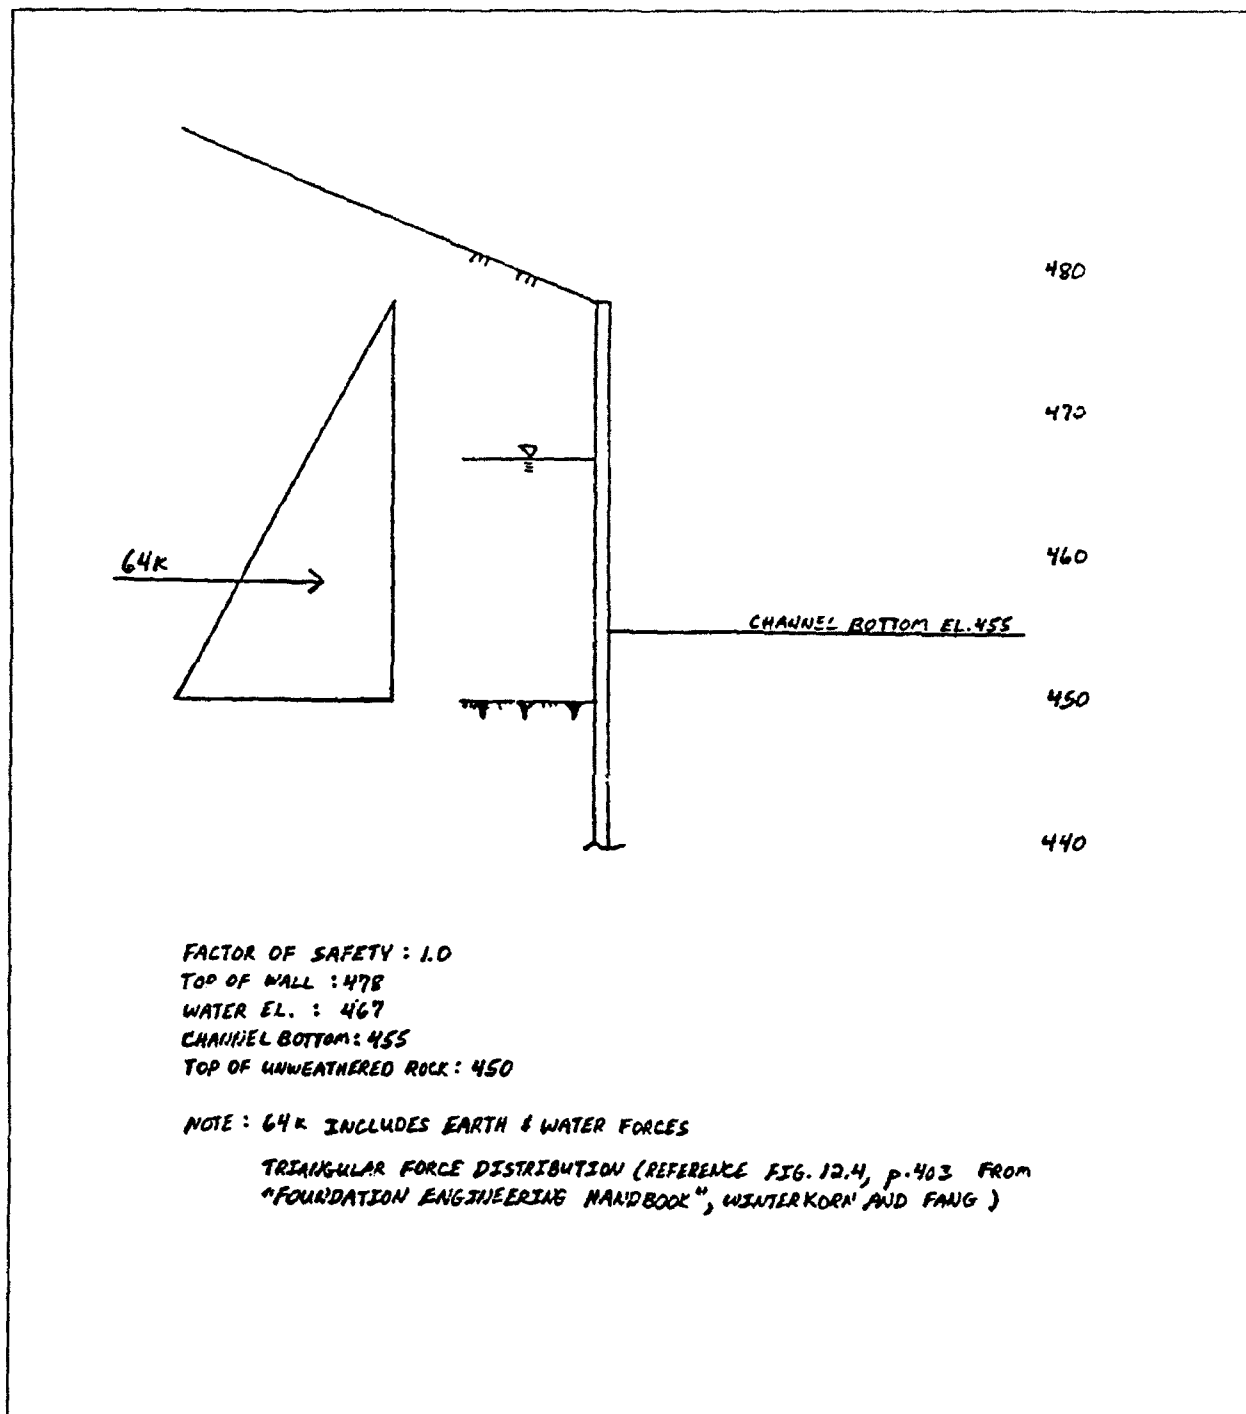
Mill Creek, Ohio, Section 1, tieback wall forces
